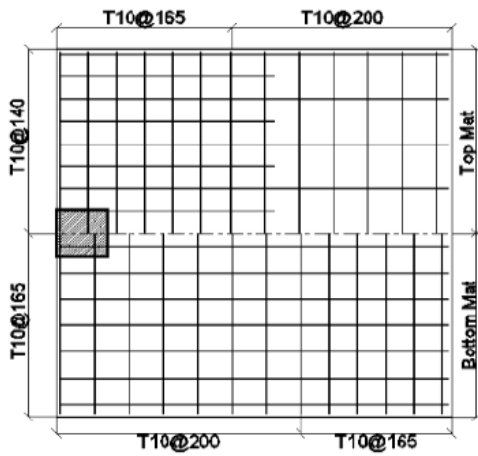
Layout of slab reinforcement for all specimens except SRR2, SRR3 and SRR4.
